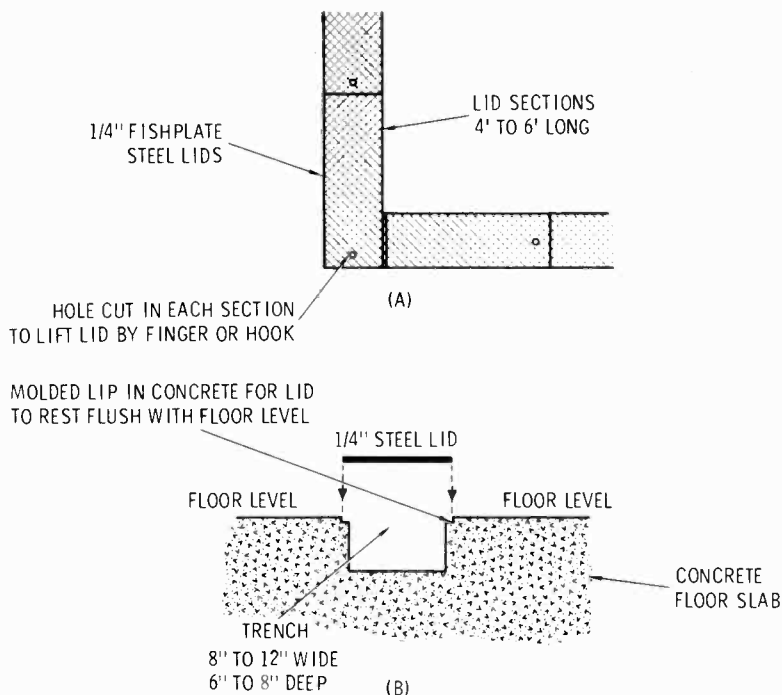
A typical floor trench (or duct): (A) Top view. (B) Cross-section.
